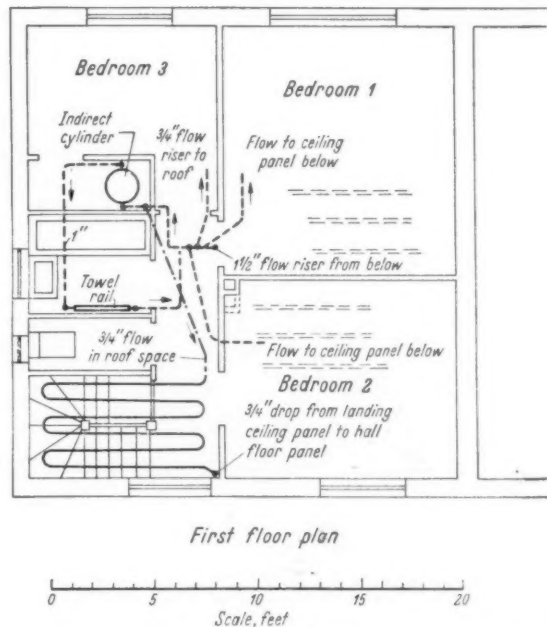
A.—System 5, embedded ceiling panels (first floor).
